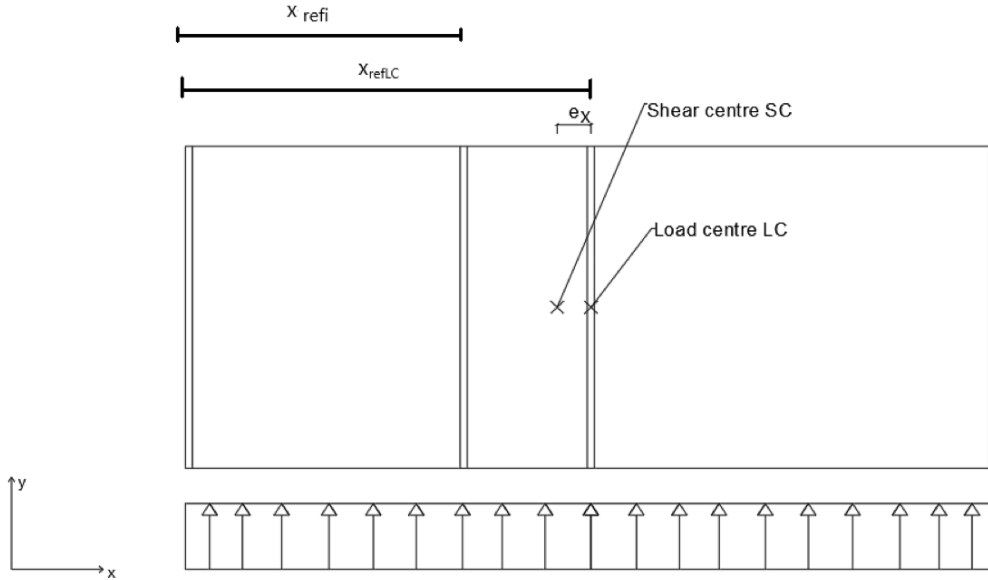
Plane geometry with shear centre and load centre marked. Load in y-direction.
